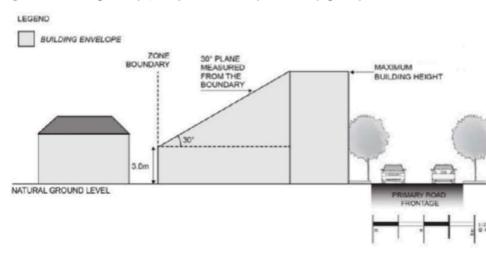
Building Envelope, Unley Council Development Plan (Figure 1)
